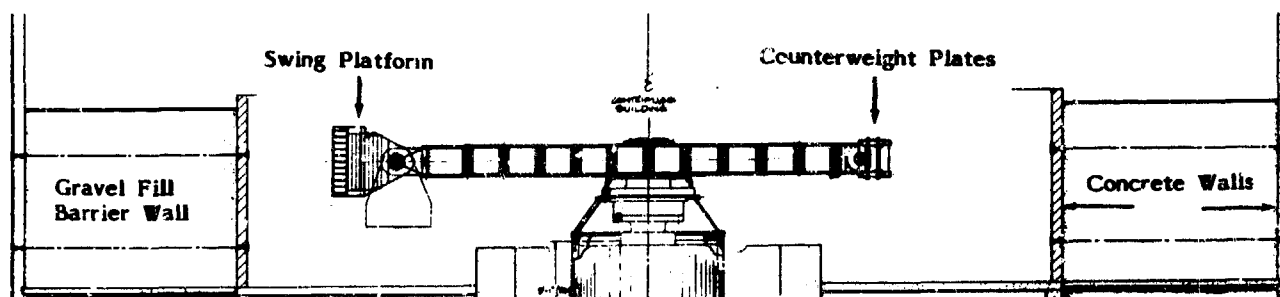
Cross-section of National Geotechnical Centrifuge and proposed barrier wall.
